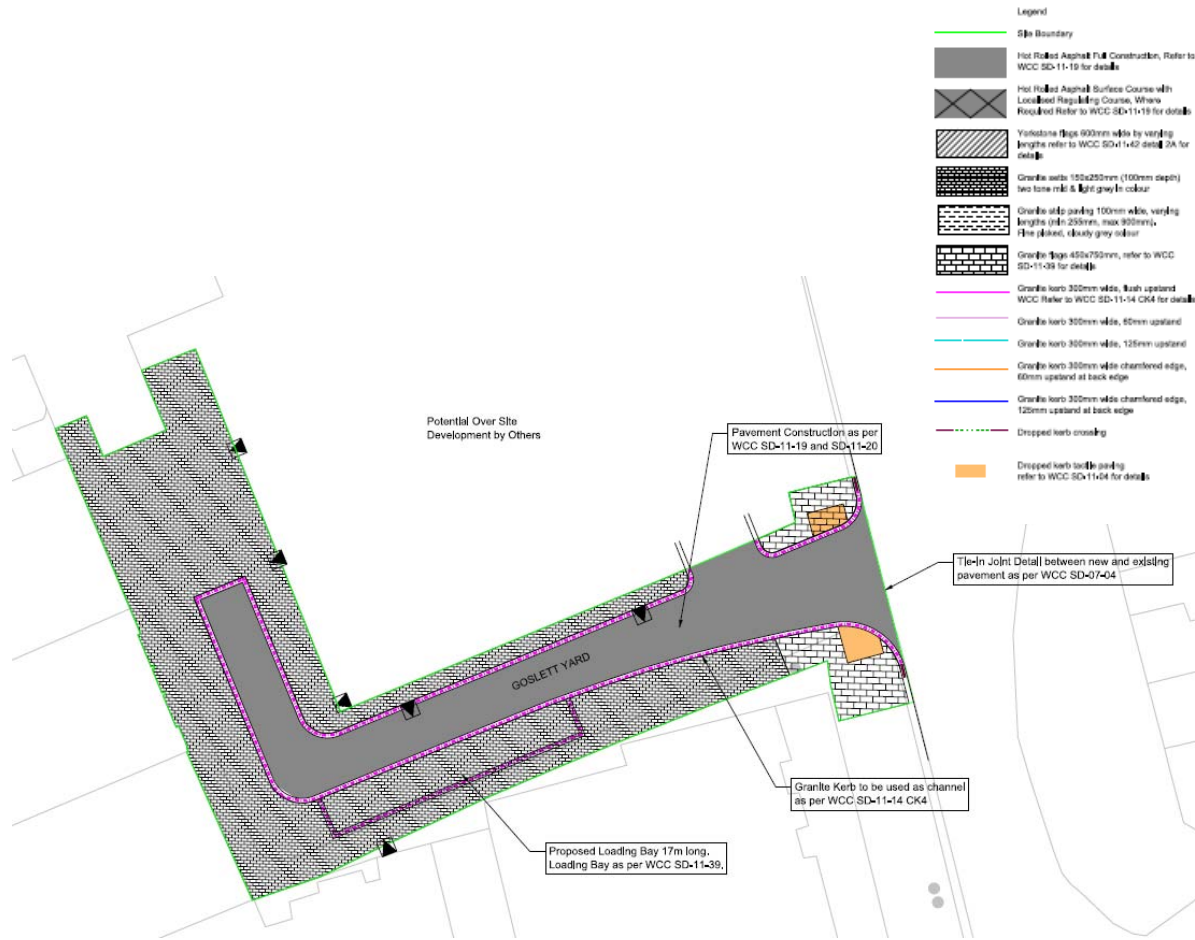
Pavements and Kerbs Layout, Goslett Yard Box
